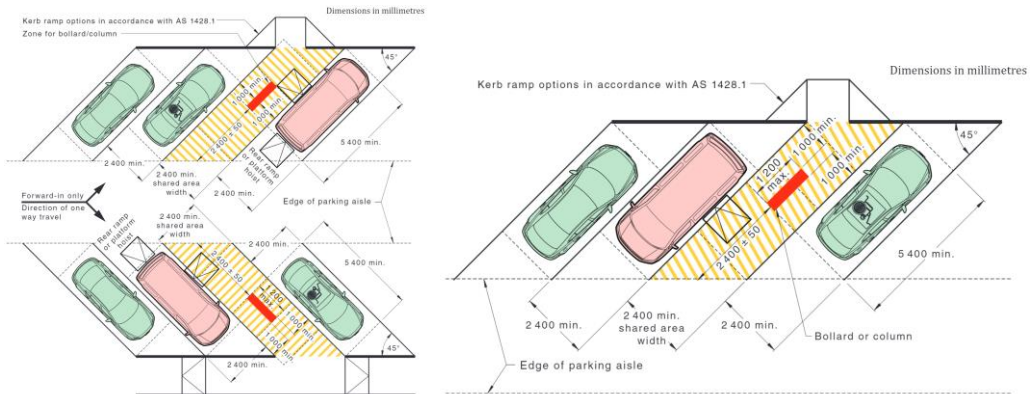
Example of 45° parking with an adjacent shared area and kerb ramp or in-line kerb ramp (allowing forward in-parking, and both forward-in and reverse-in parking, respectively). Adapted from AS 2890.6
